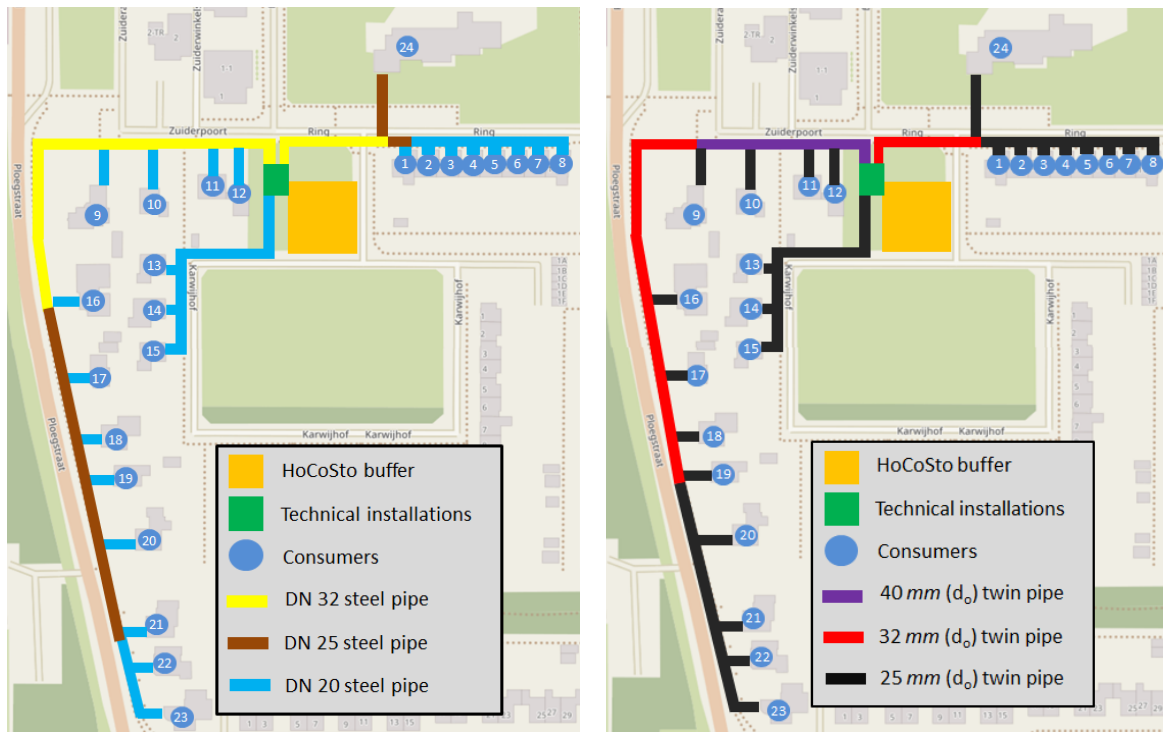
Layout of the steel pipe network which shows pipe diameters for every section. Figure 4.14: Layout of the flexible twin pipe network which shows pipe diameters for every section.
